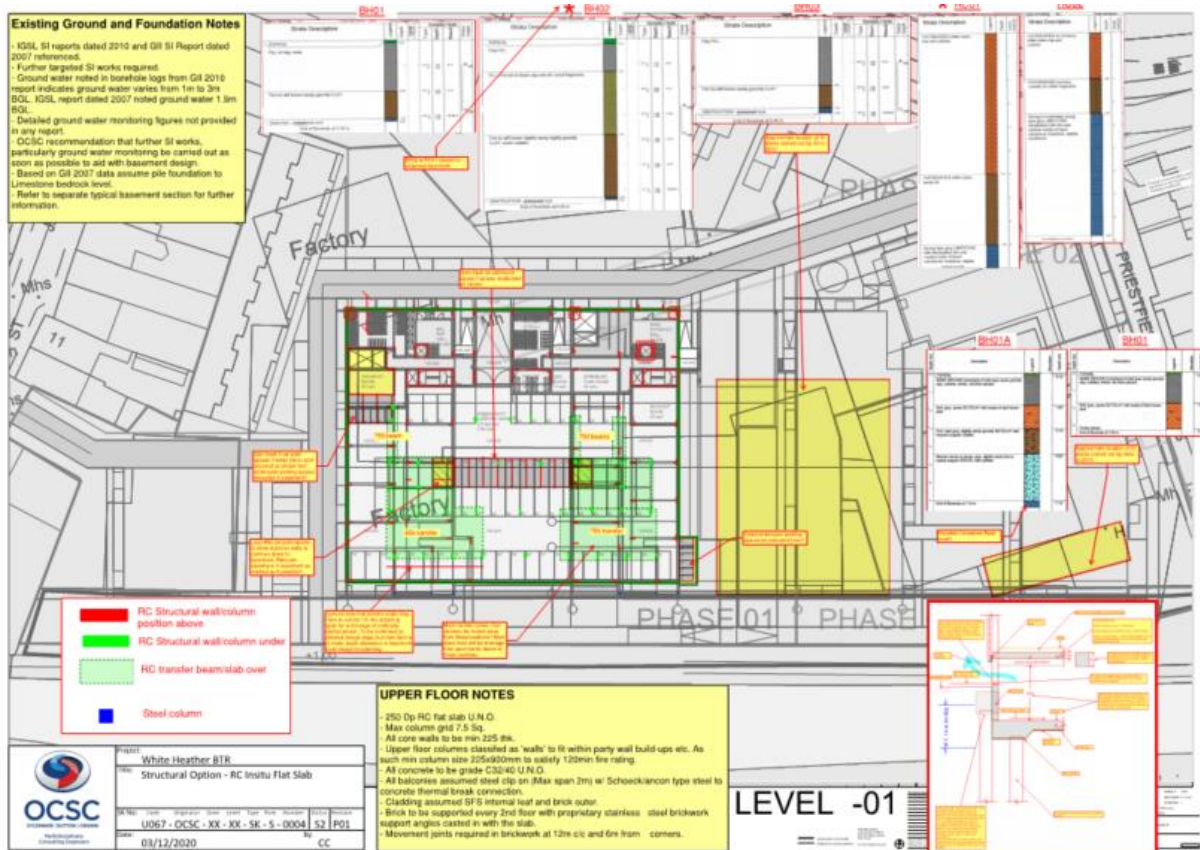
OCSC initial draft under-croft construction mark-ups & available SI logs (not layout is superseded but principal remains)
